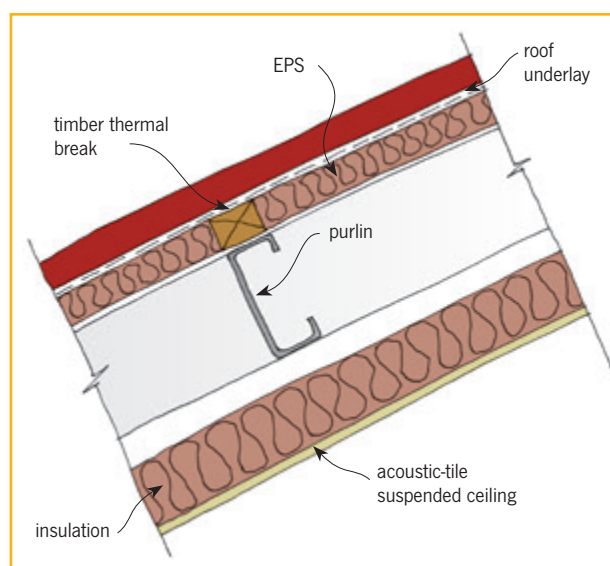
Roof specimen 2: A timber thermal break between the purlin and roofing underlay with EPS polystyrene sheets installed between the thermal breaks and immediately below the roof underlay. The EPS is not structural.
